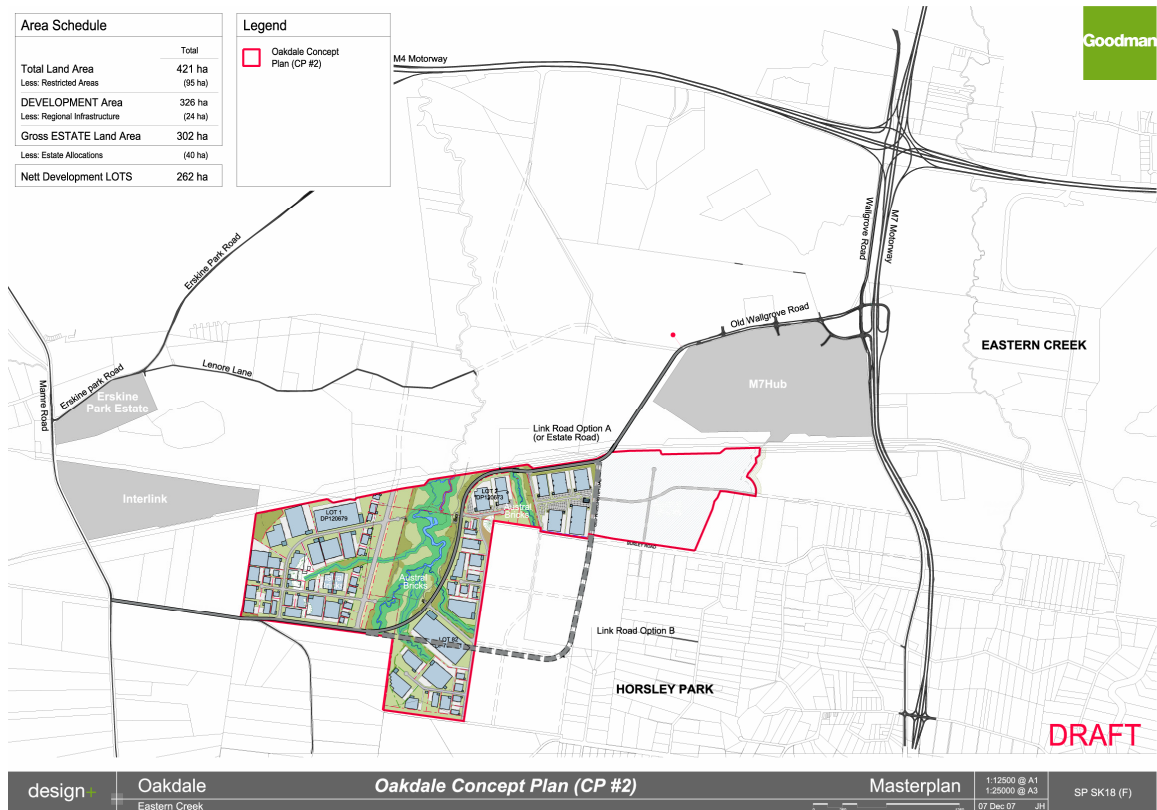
Oakdale Concept Plan (CP#2) – Masterplan
